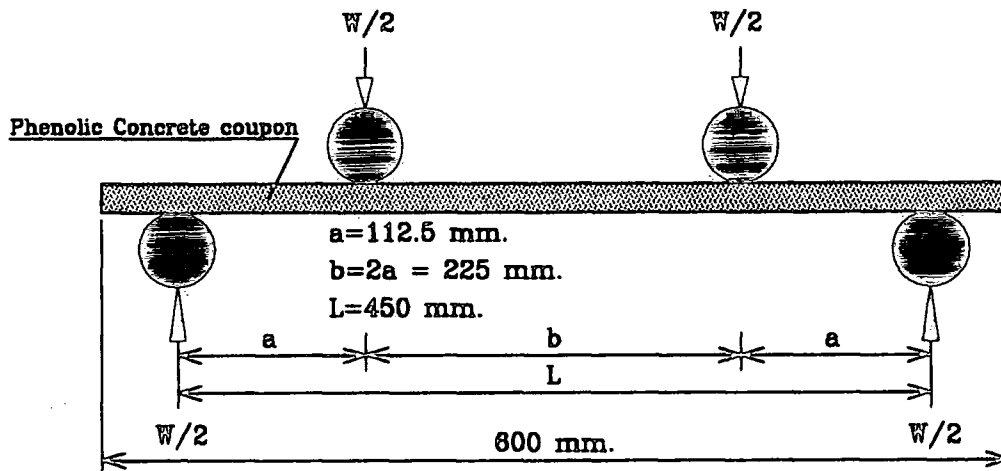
Phenolic Concrete coupon specimen and the loading geometry
